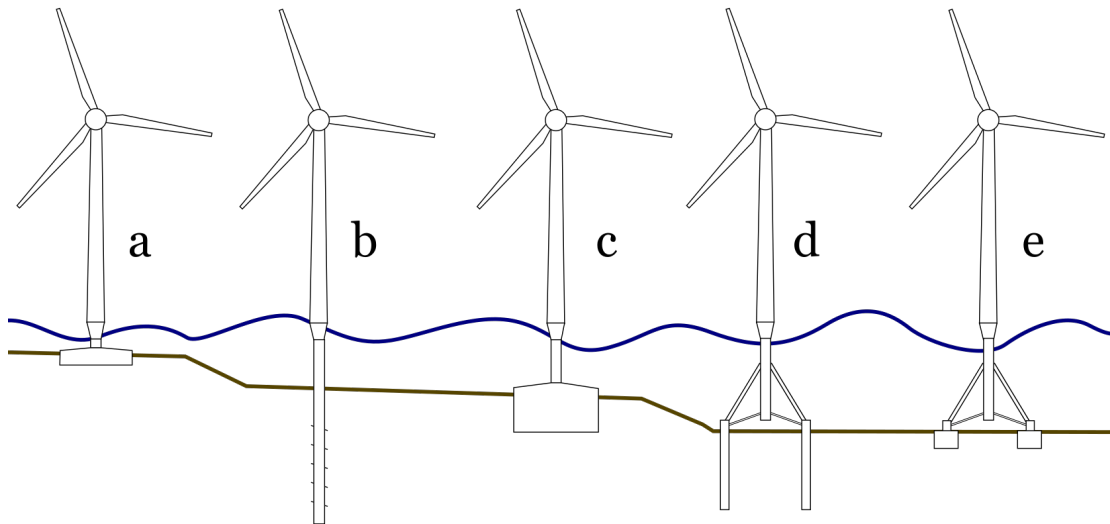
Types of offshore wind tower foundations. Adapted from Breton and Moe (2009)
